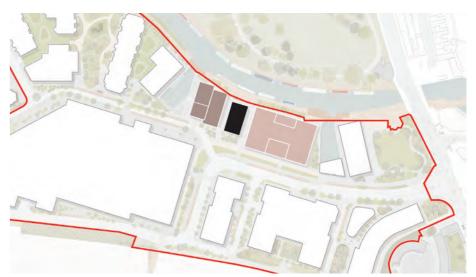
Plot 5.4 a modestly scaled pavilion building
